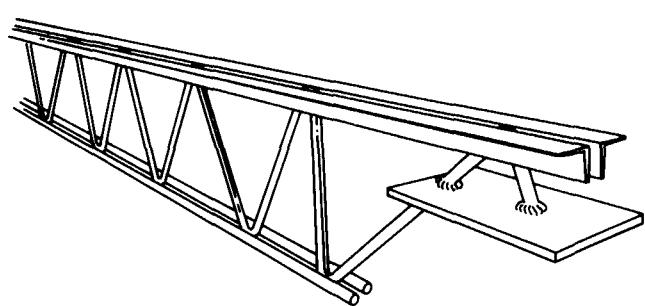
(b)(i)2 Open-web bar joist construction.
